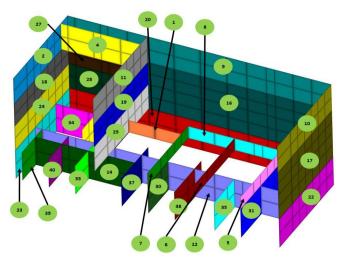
Low-Rise Shearwall Concrete Building Nonlinear Model
